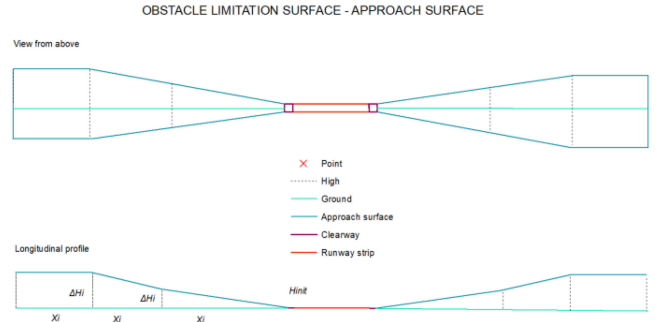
Obstacle limitation surface—approach surface (plan view and cross section).
